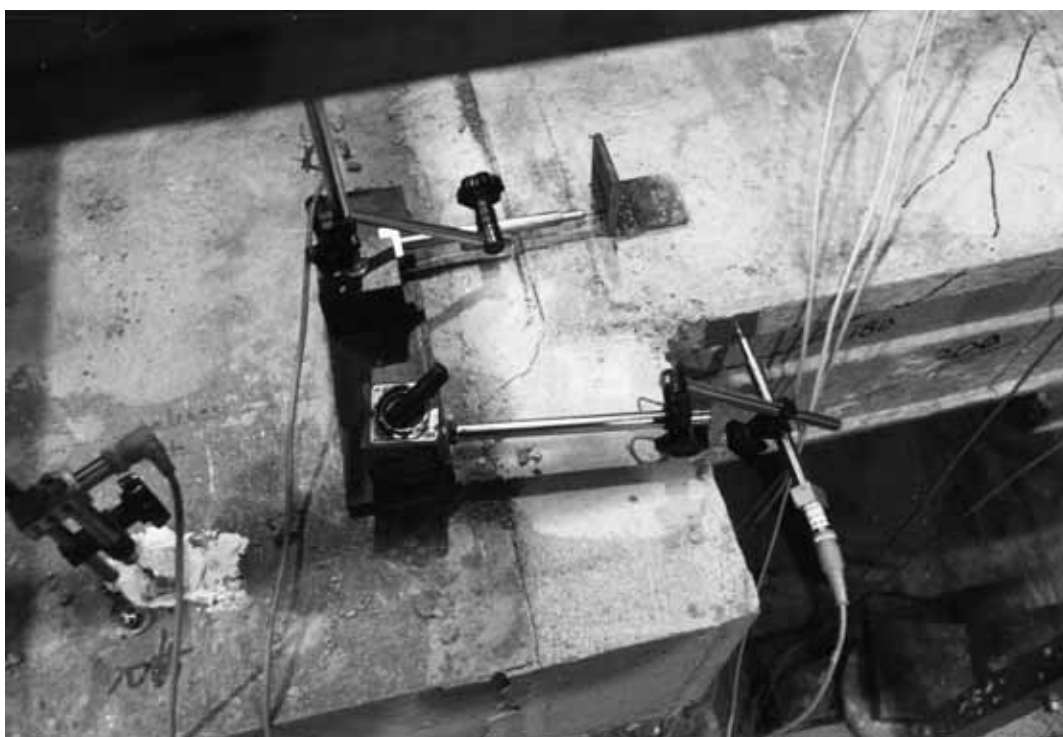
Cracks after failure in slab 8 and in the joint concrete.
